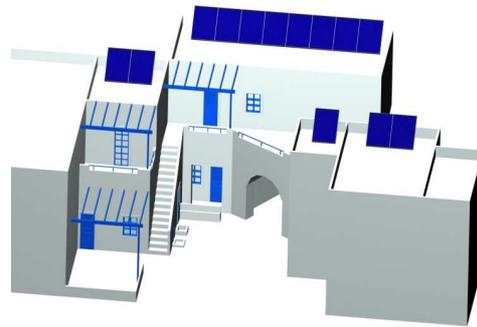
Blue flat plate collectors on the roof of a house at a Cycladic island (architectural design)
